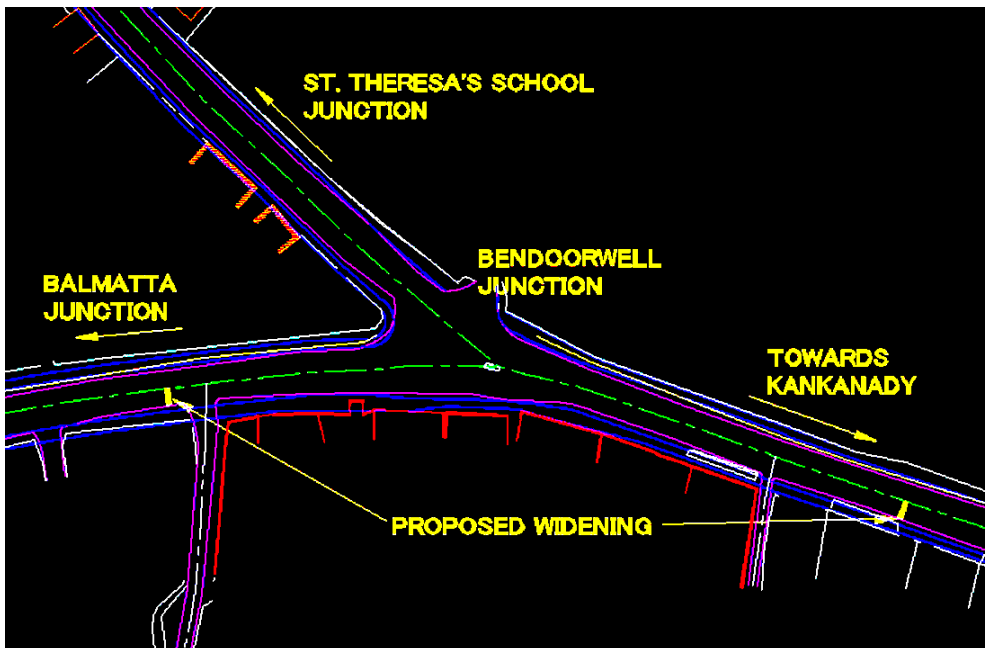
Details on the Existing Layout at Bendoorwell Junction
